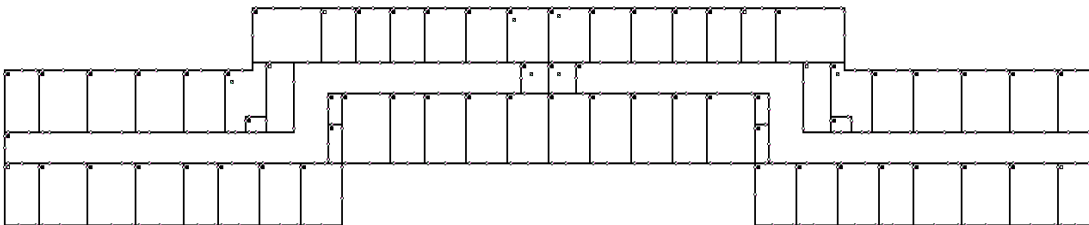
Building B floor plan for upper (resident) floors, as constructed in multi-zone model.
